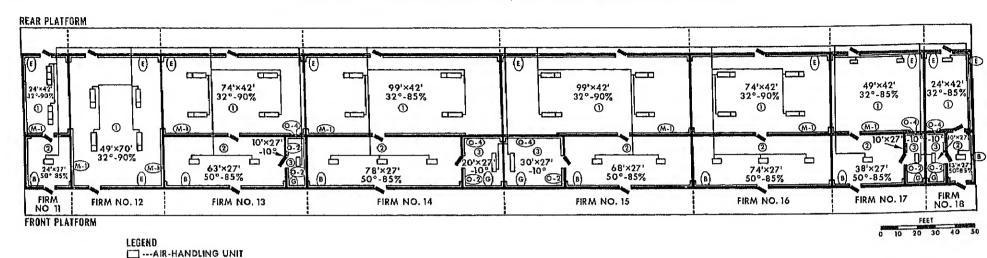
Situation III, Building No. 2 (meat and meat products), floor plan and air-handling equipment layout.
